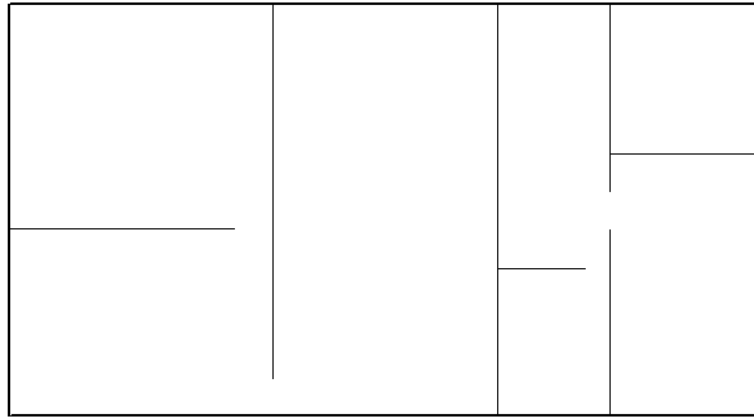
Floor plan used for RT simulation (Inner rooms of Atwater Kent building)
